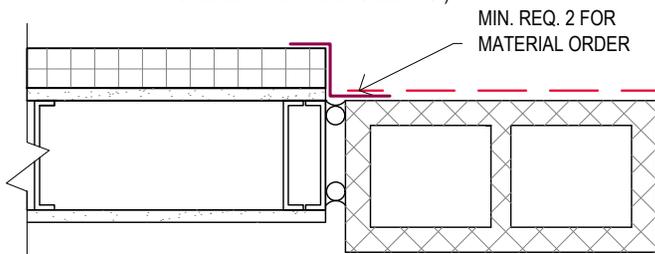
TRANSITION FROM ULTRA TO WRB ON CMU | PLAN
